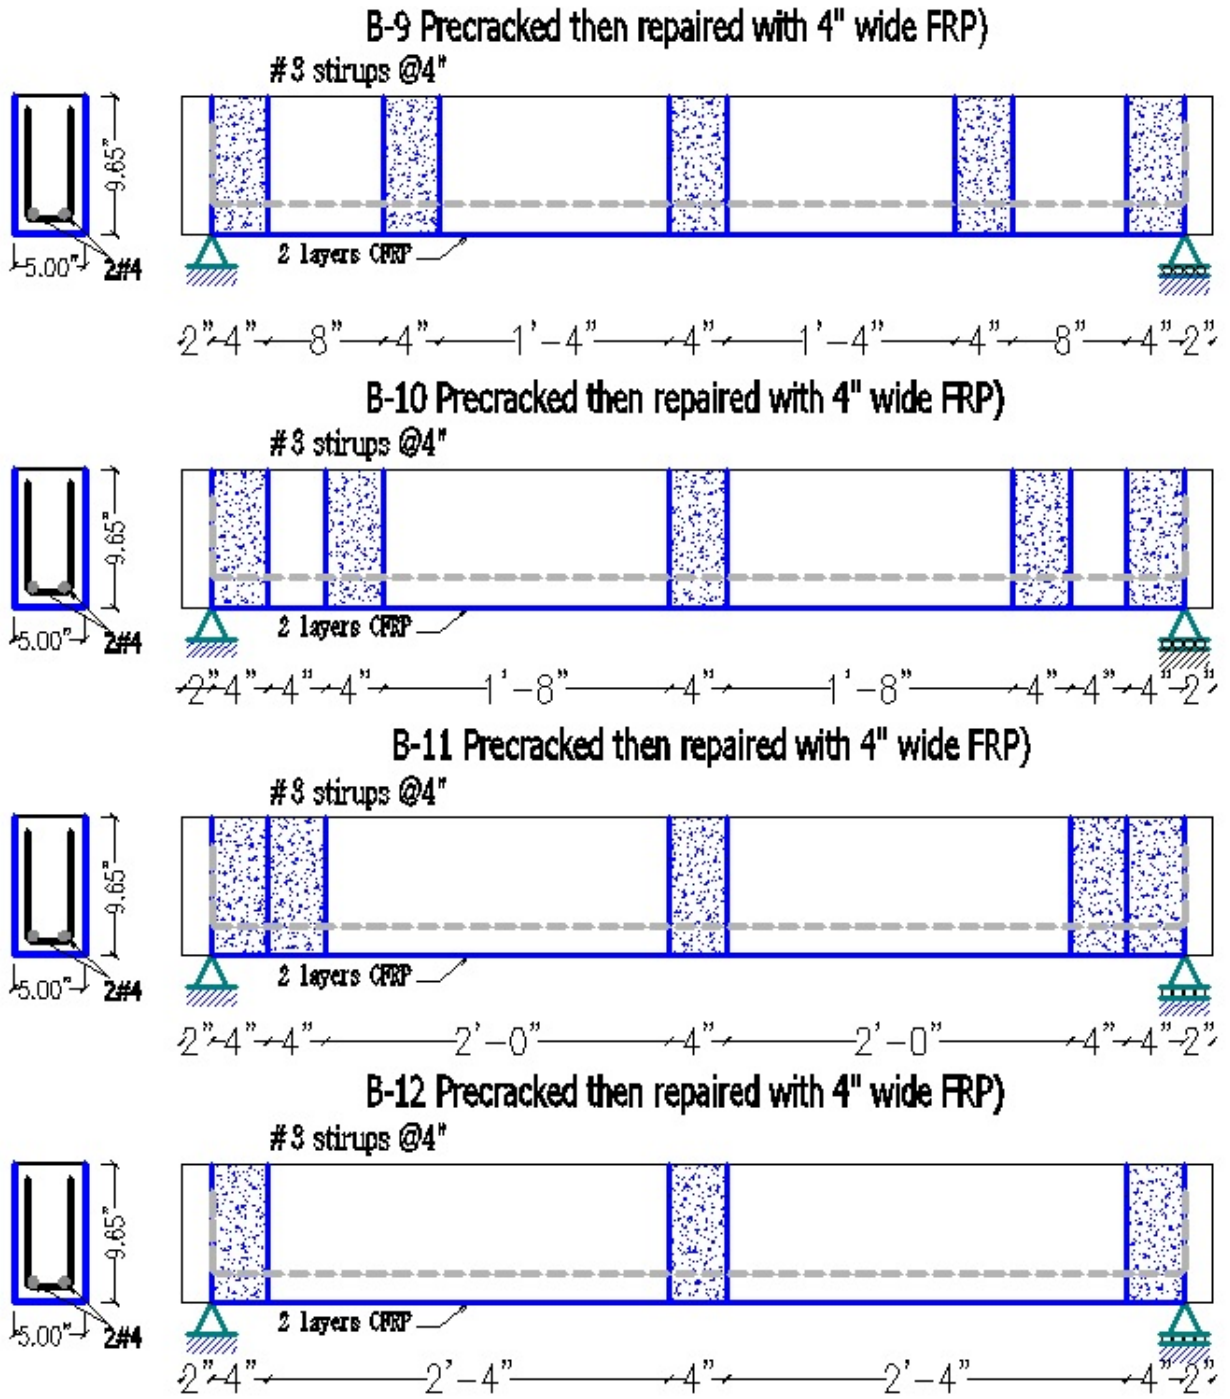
d Set #2 Beam Details.[1 ft=304.8mm, 1 in=25.4mm]
